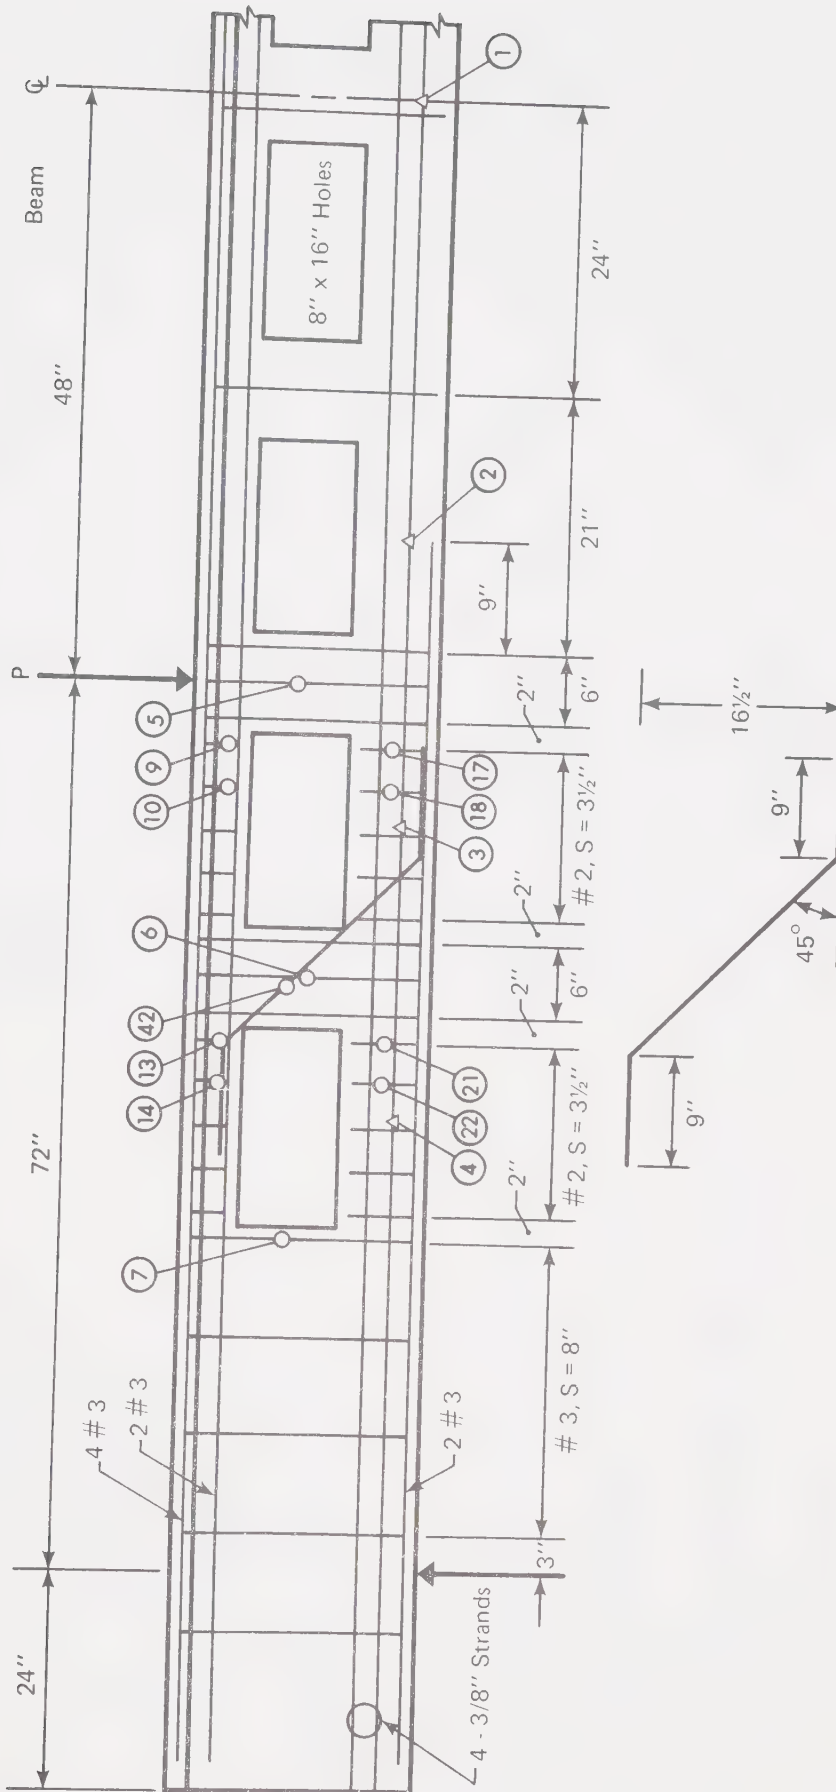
Reinforcement Details and Strain Gage Locations for Beam 10-16-6
